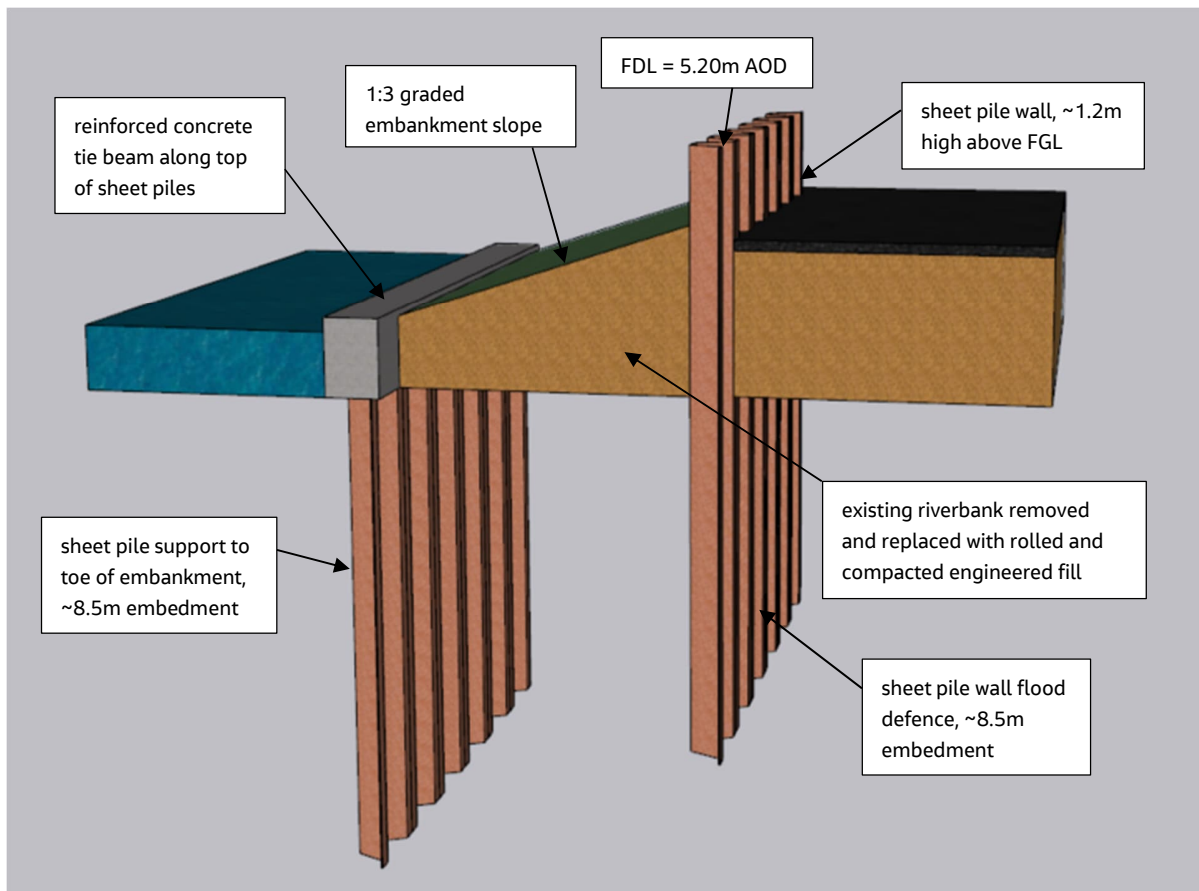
Option B1, bare sheet pile flood wall and bank stabilisation
